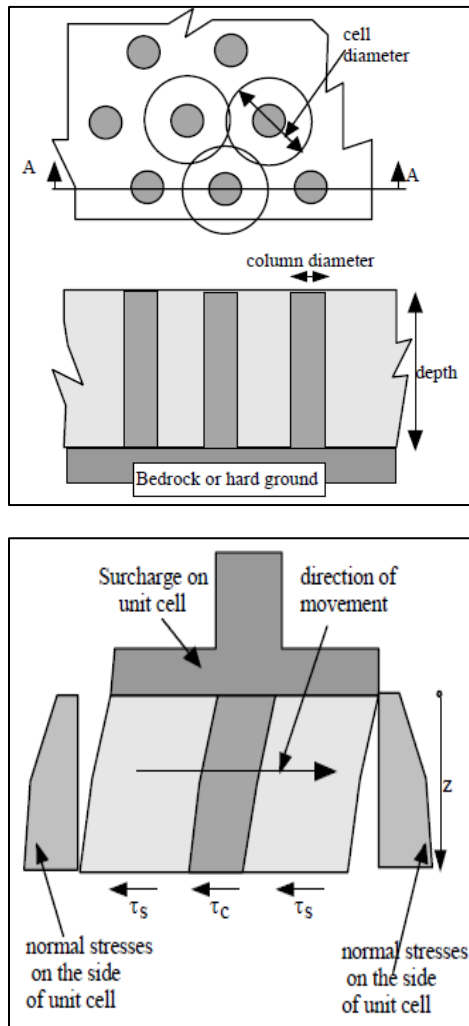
Stone column arrangement and FBD of unit cell block [5]
